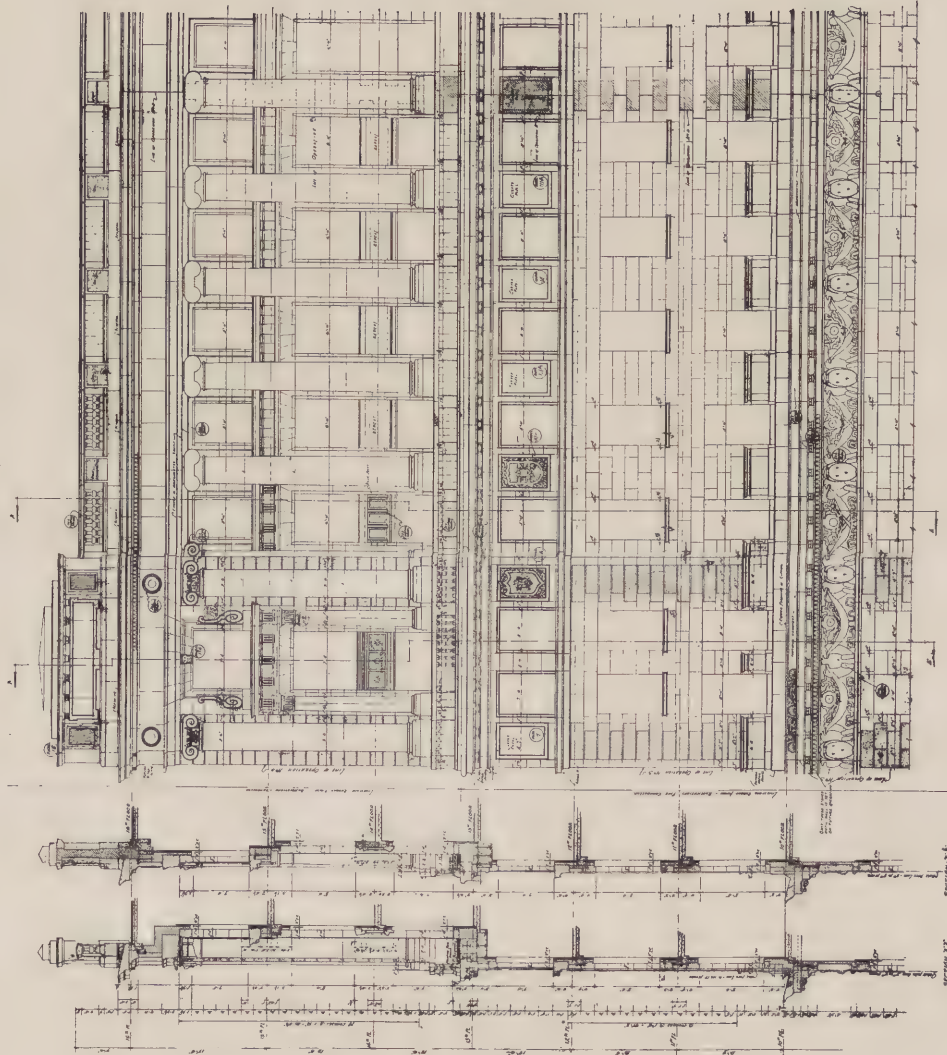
Elevation on Broadway, Building for the Standard Oil Company, New York City. Carrere & Hastings, Architects. Shreve, Lamb & Blake, Associated.
